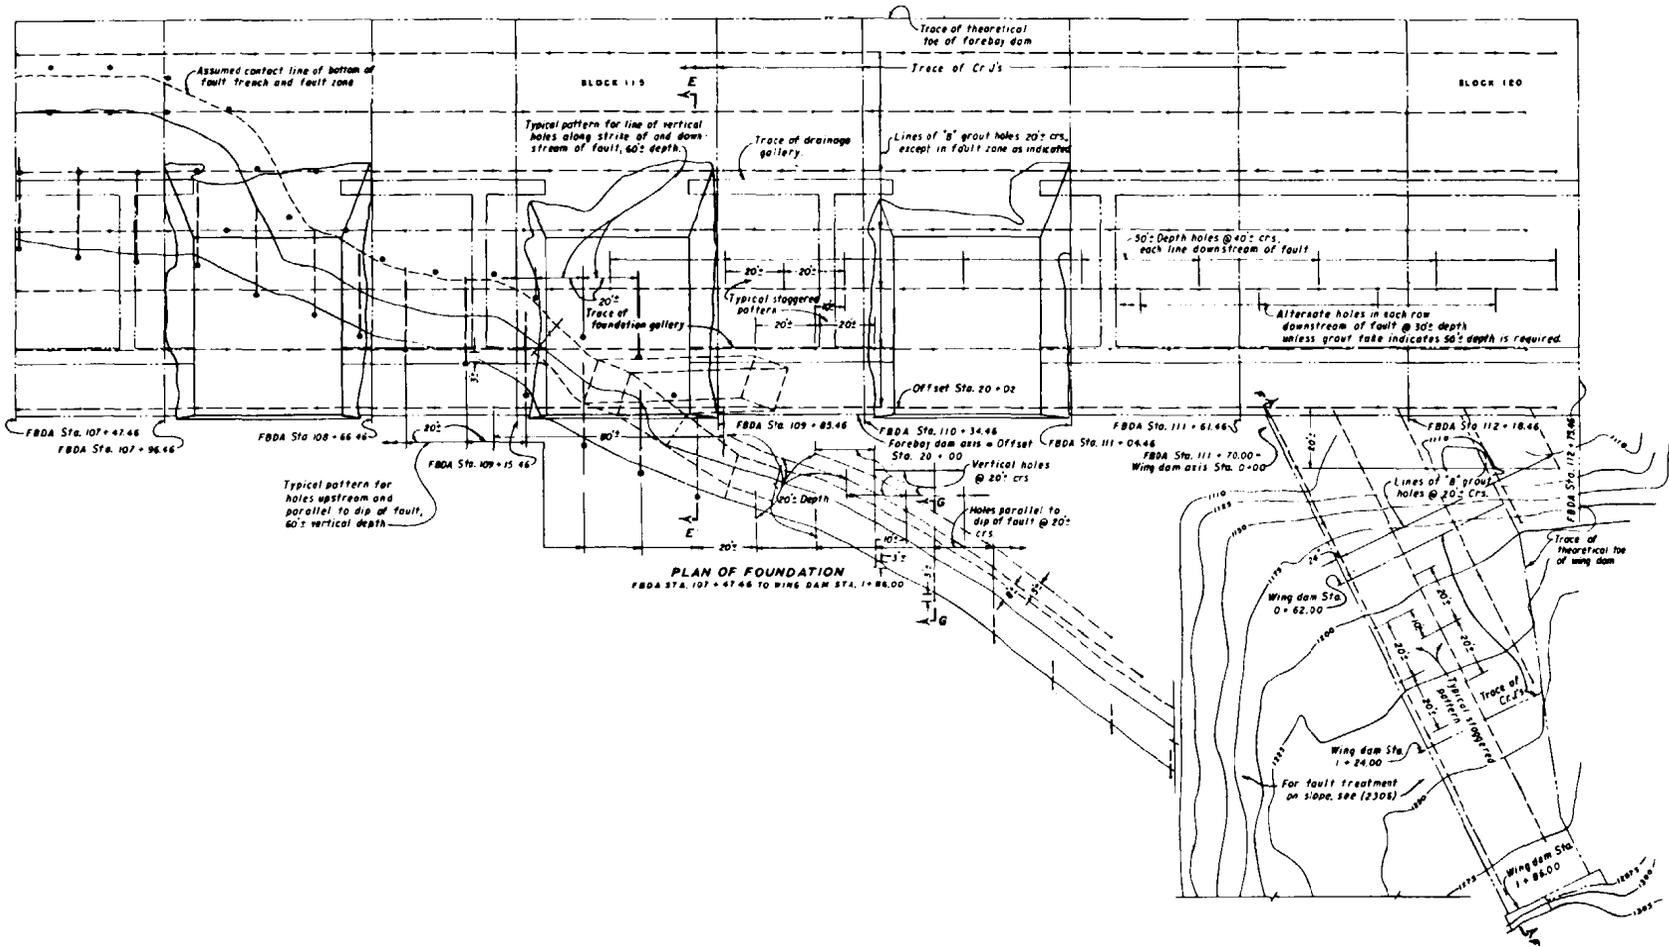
Foundation treatment for Grand Coulee Forebay Dam in Washington (sheet 1 of 2).—288-D-3005(1/2)
